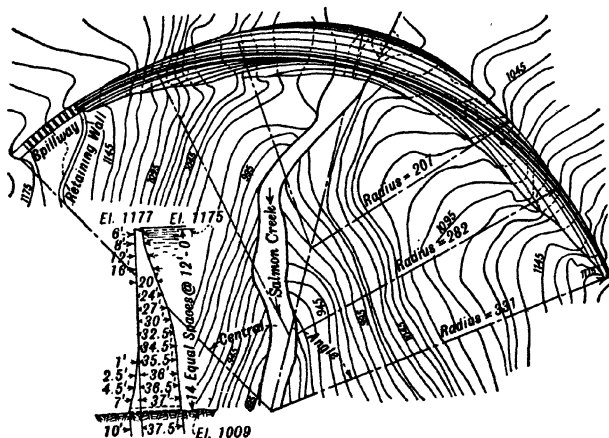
Typical Constant Angle Arch Dam, 168-ft. high for Salmon Creek, Alaska.
